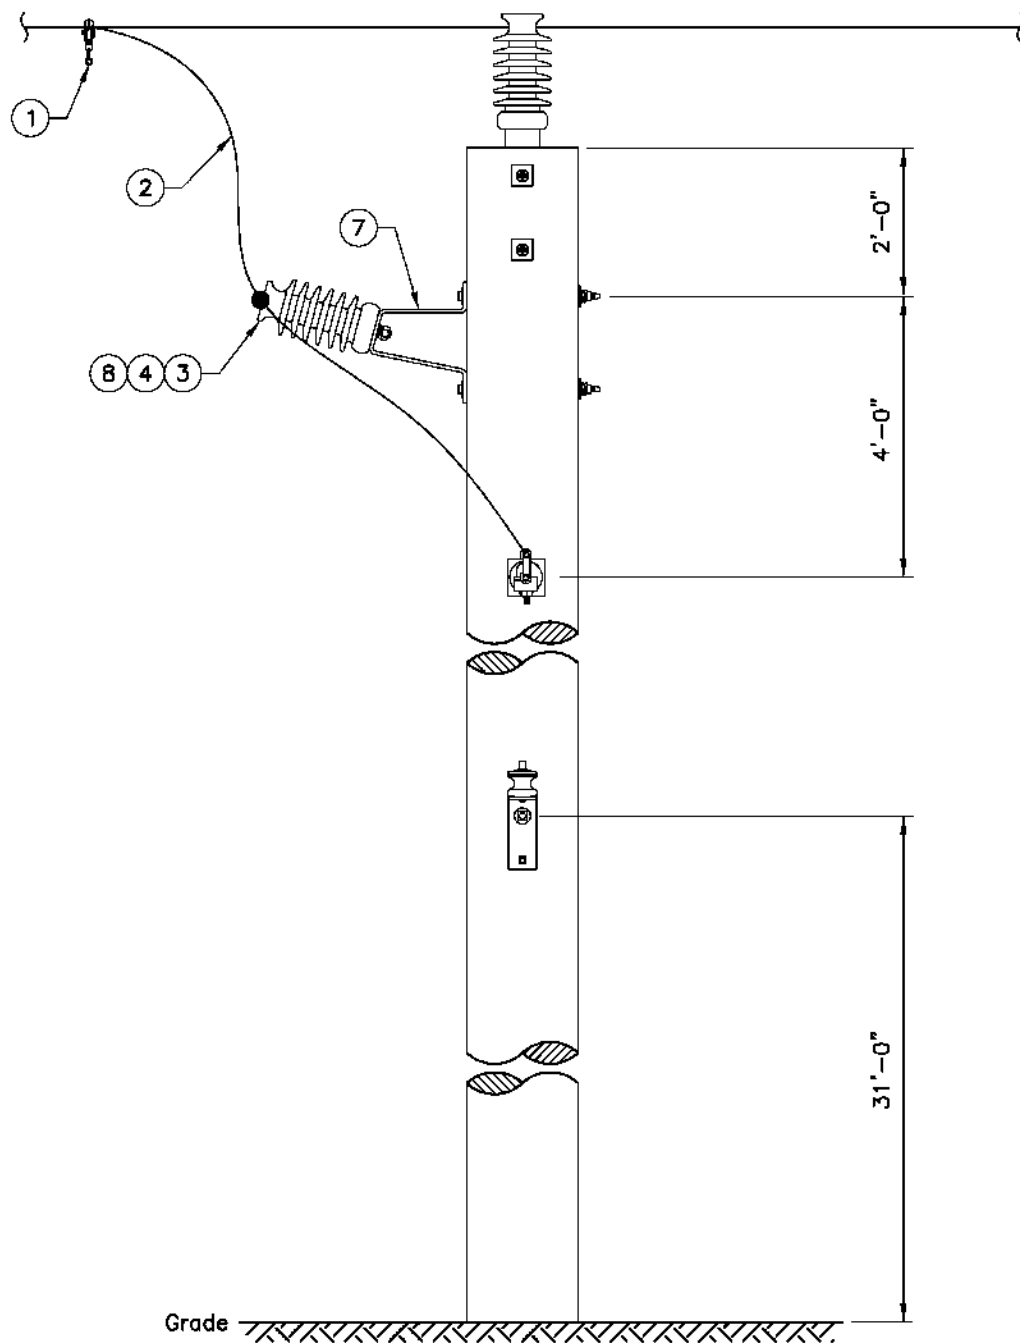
Single-Phase Multi-Gain 0°-100° Deadend to Deadend Side Mount Jumper, Side View
